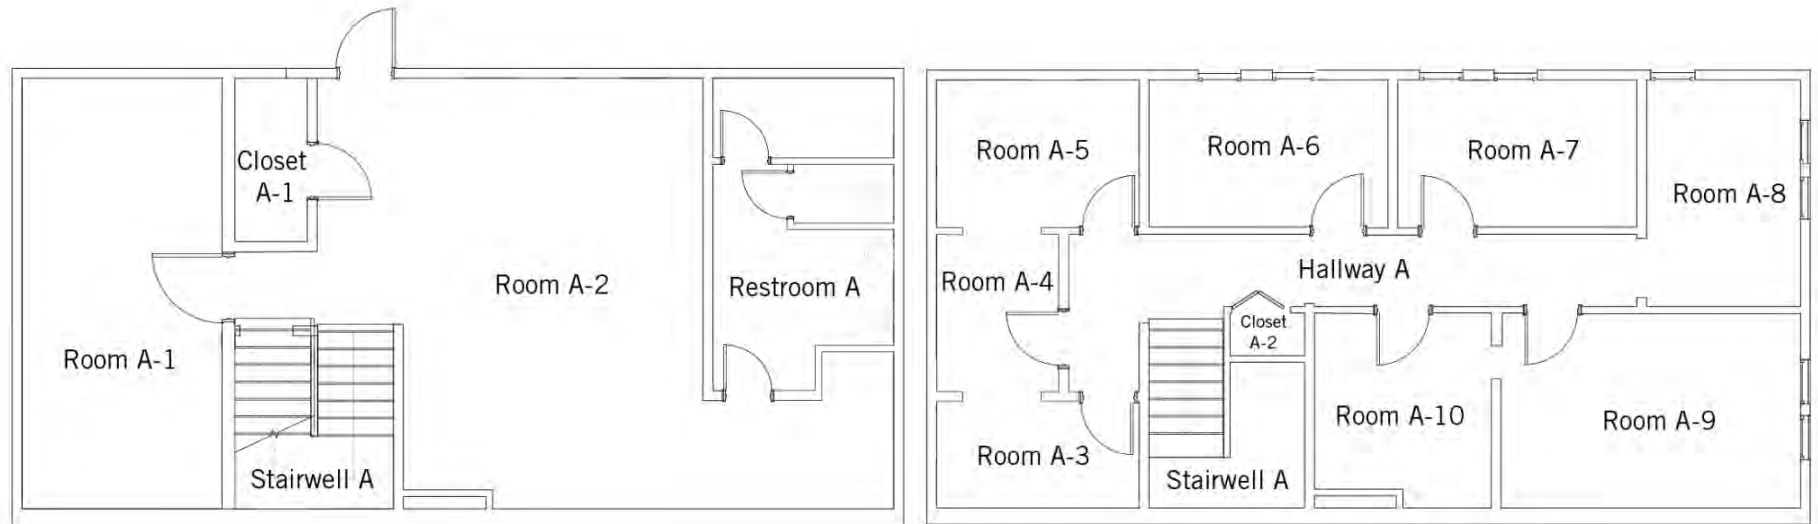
(LEFT): Floorplan of 1980 Addition first floor, showing names of spaces labeled for the purposes of this report. (ORW Architecture, annotated by GPA Consulting).
